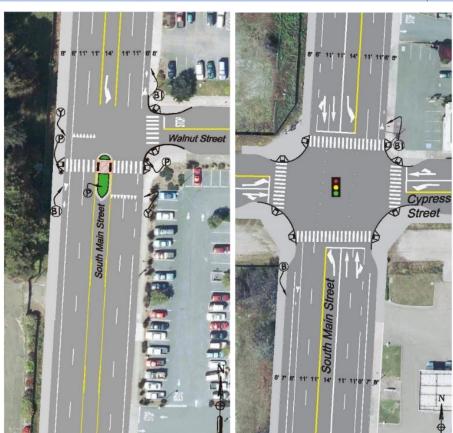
South Main Street at Walnut Street and Cypress Street Improvements Concepts (Source: South Main Street Access and Beautification Plan, 2011)
